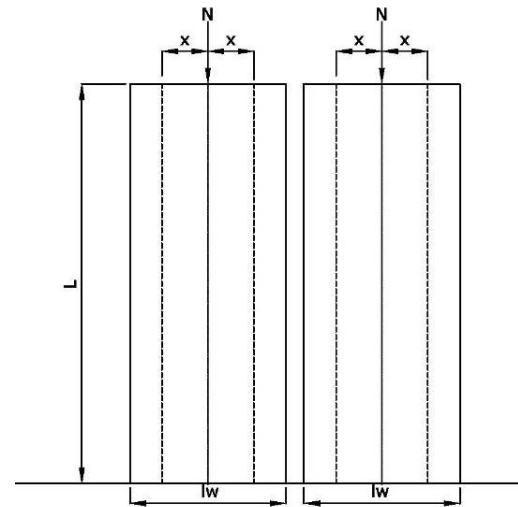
View of PT-only walls a) test specimen b) with dimensions
